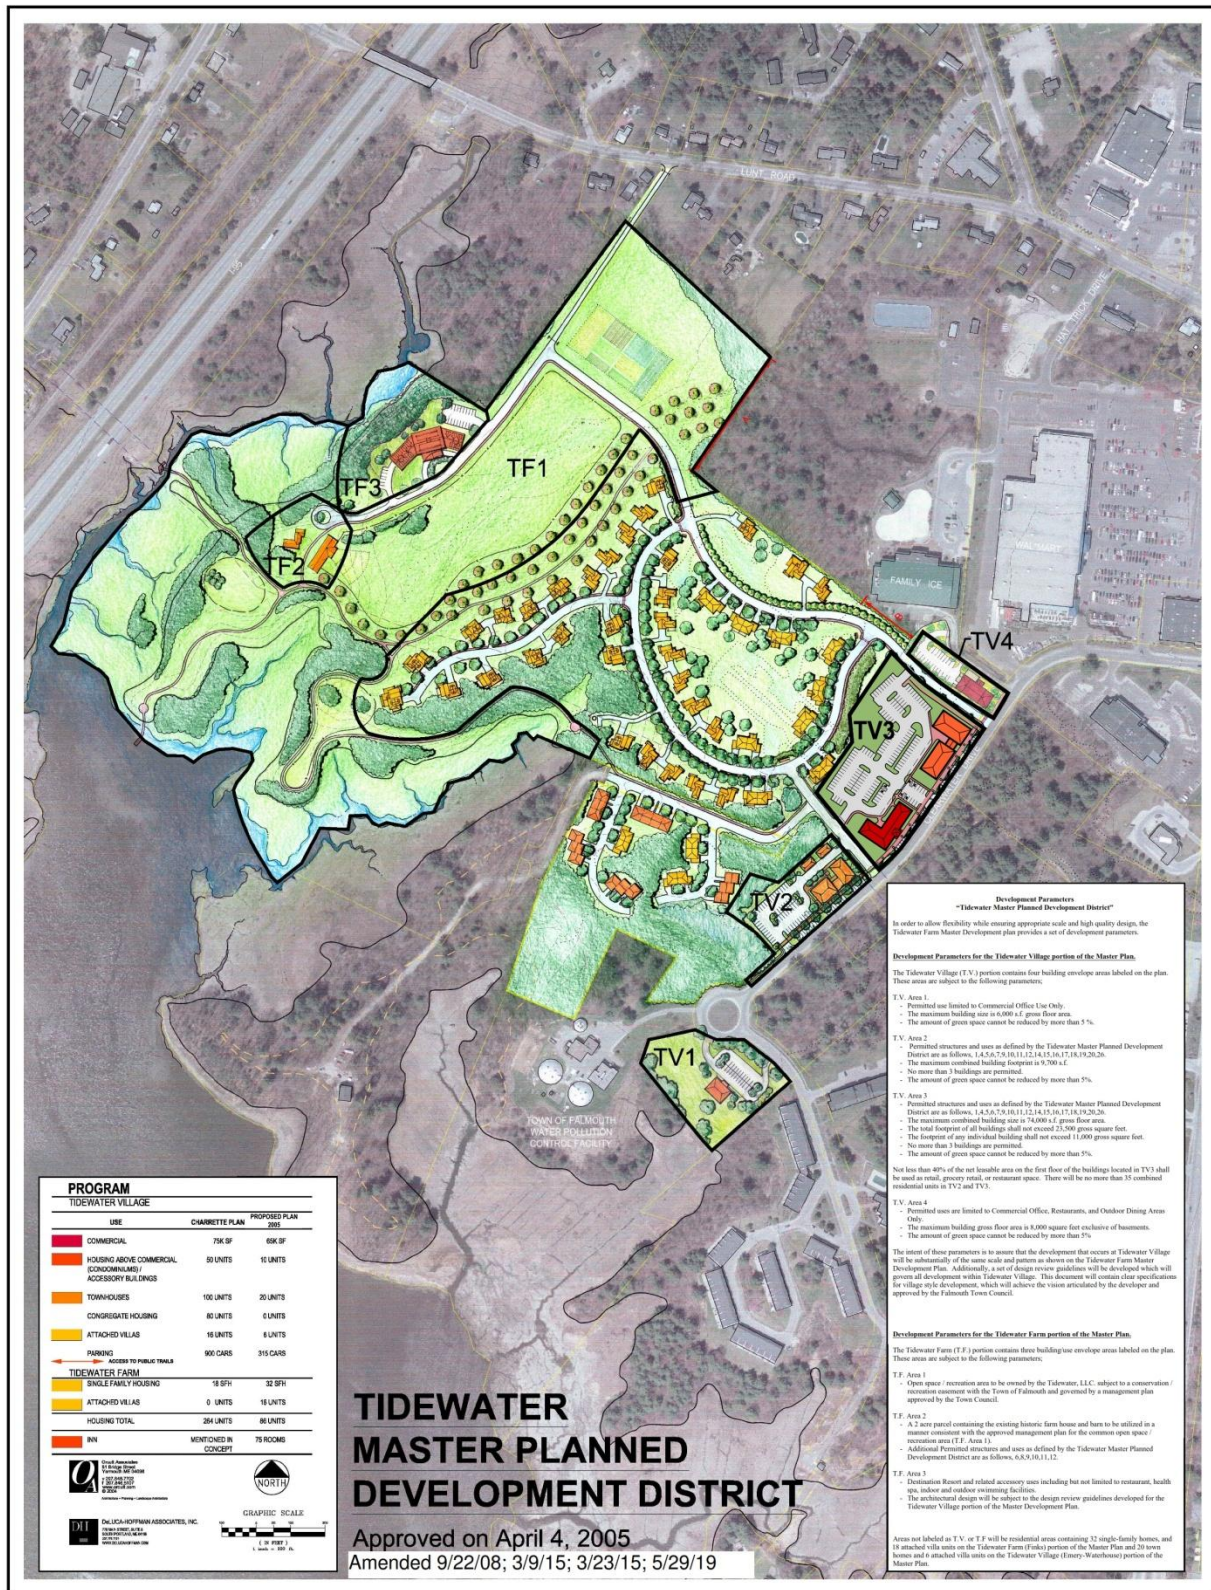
Tidewater Master Plan, Falmouth. Images on previous page labeled TV2
